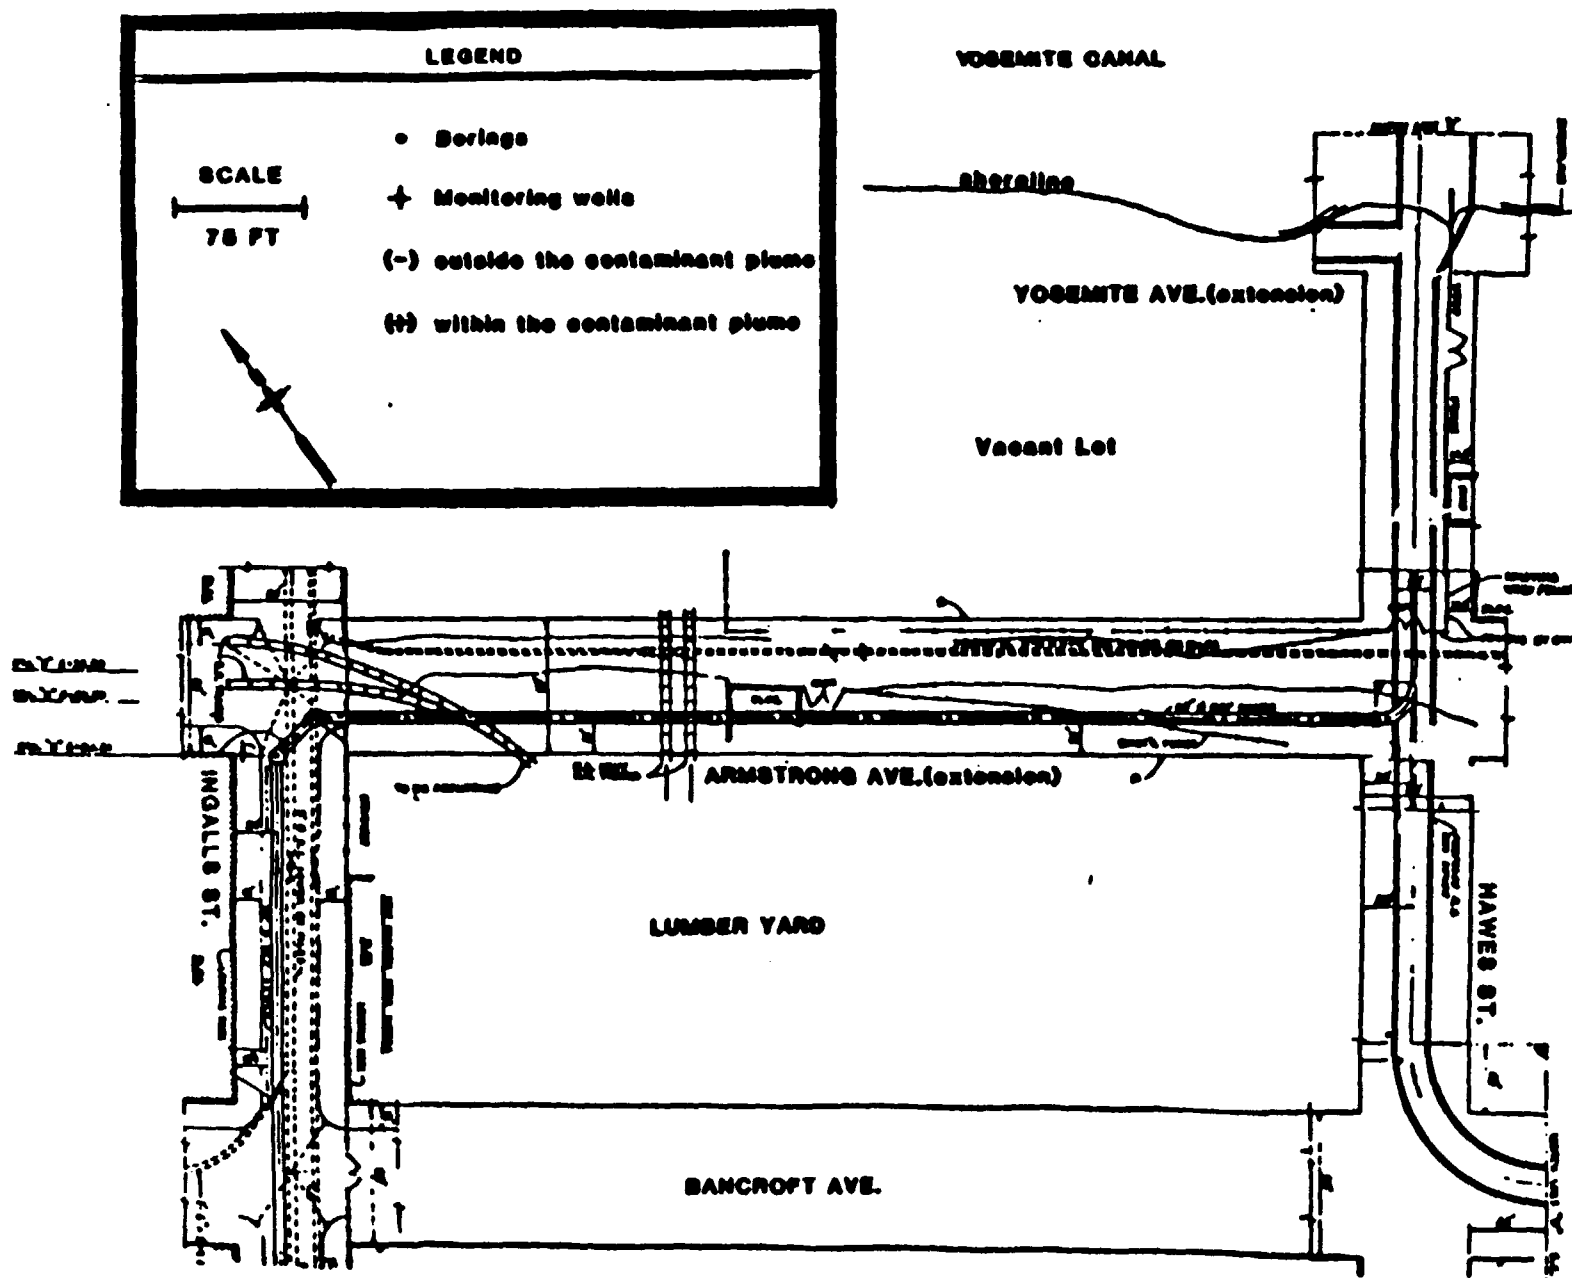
SITE DETAIL, ARMSTRONG AND HAWES
